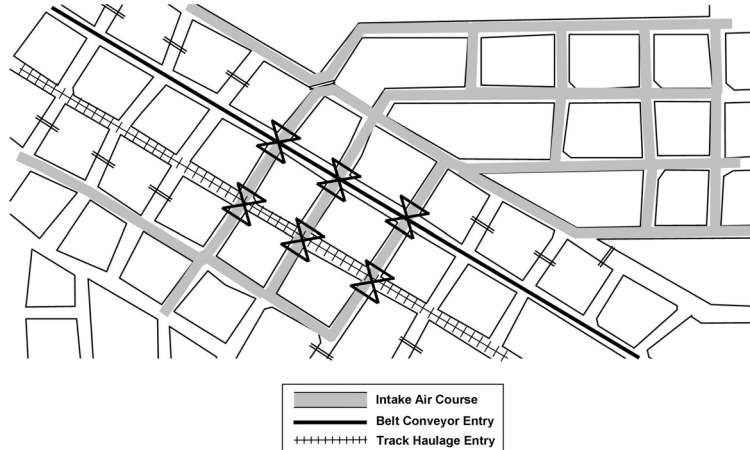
Six Overcast Alternative to Eliminate Equipment Doors
